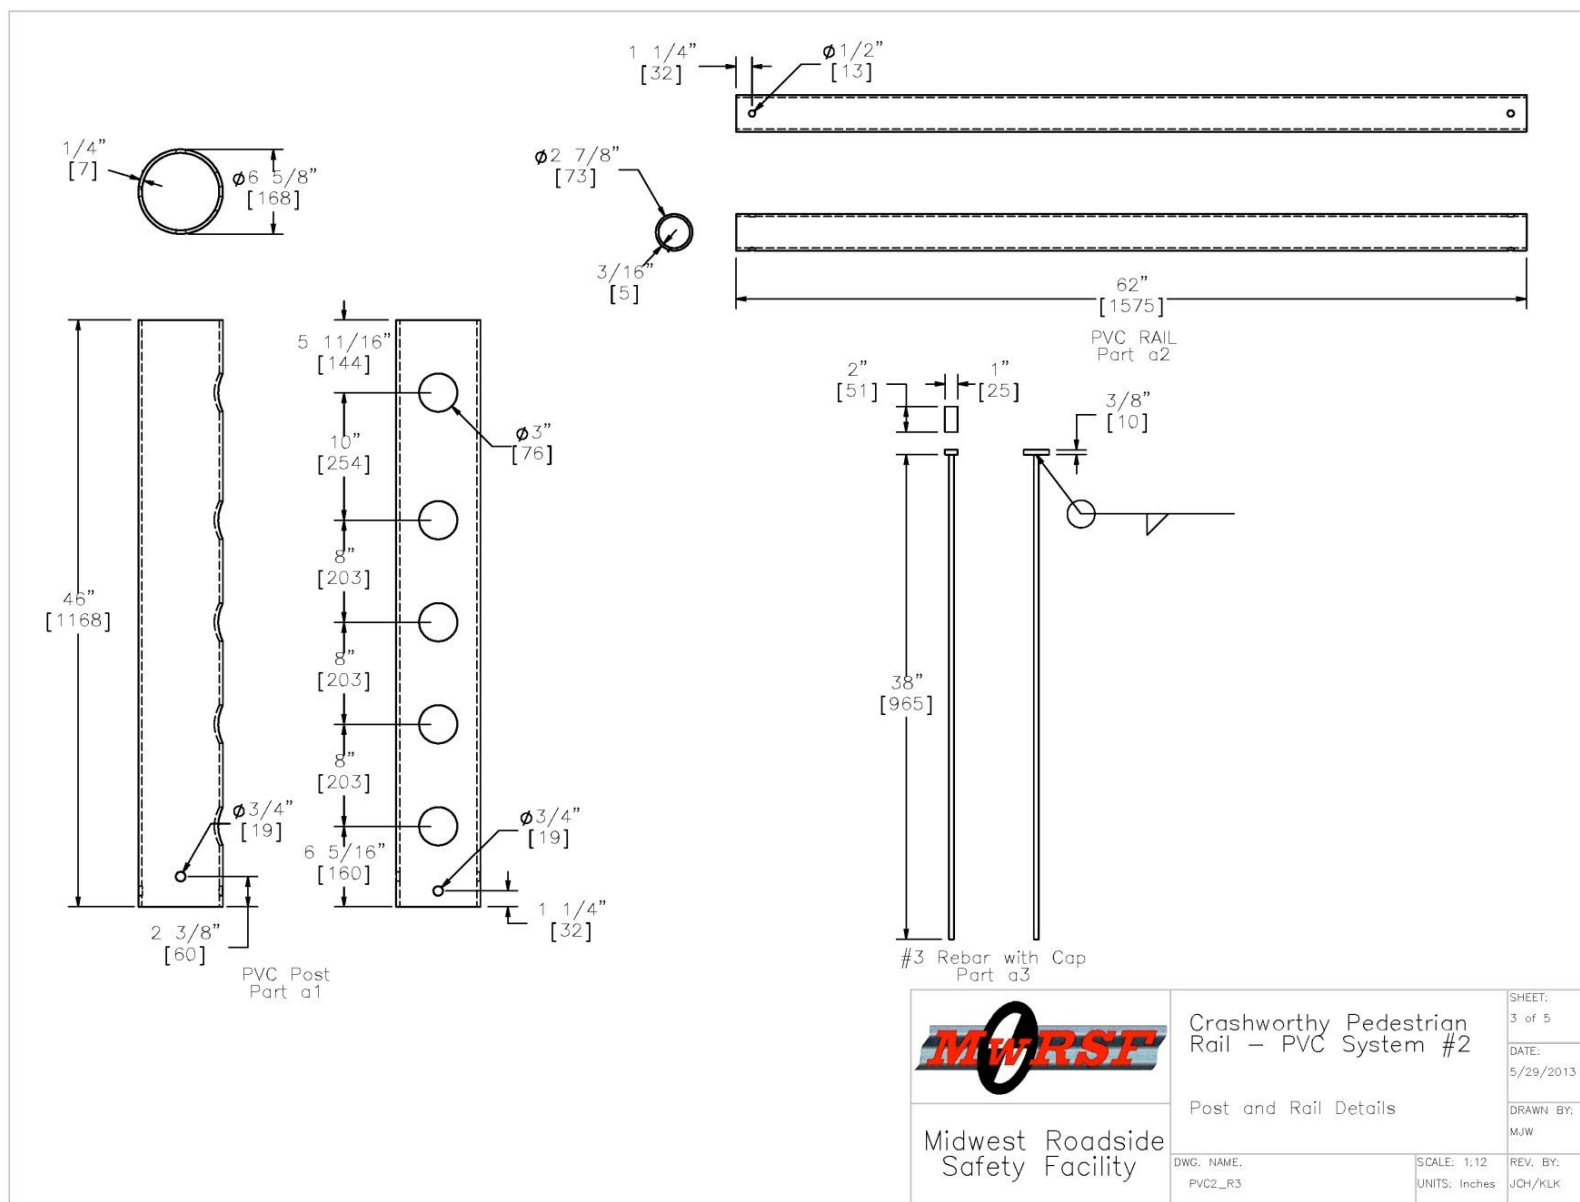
Modular PVC Rail, Design Concept PVC2-b (Sheet 3 of 5)
